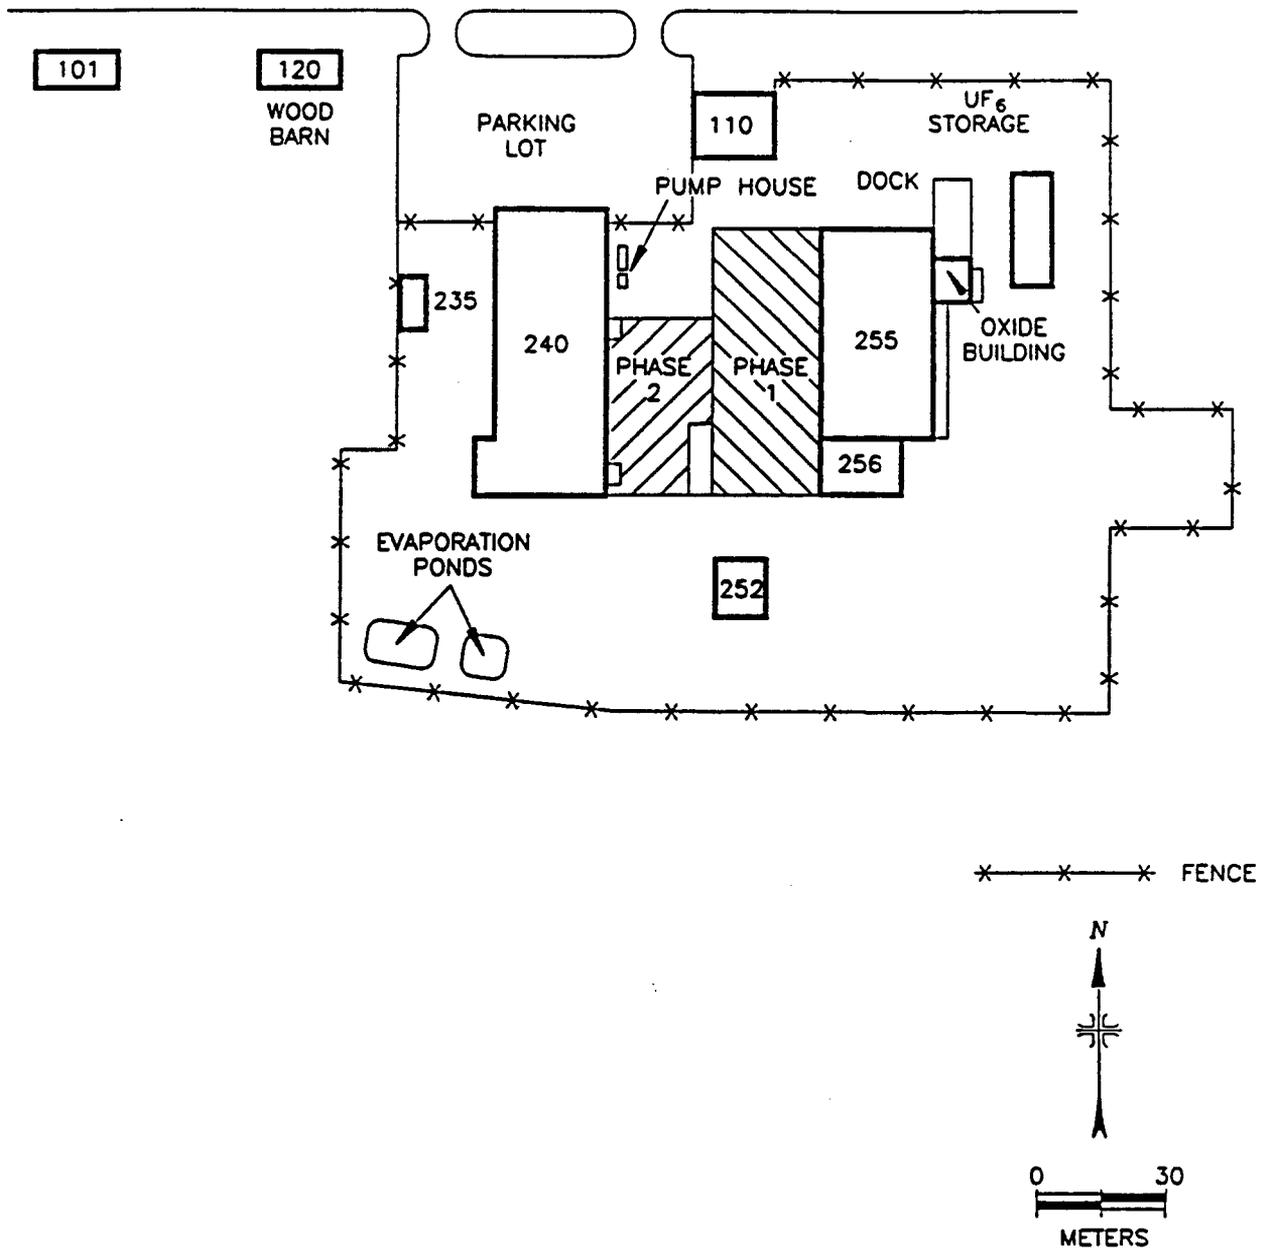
Layout of Plant Facility Indicating Phase 2 Construction Area
